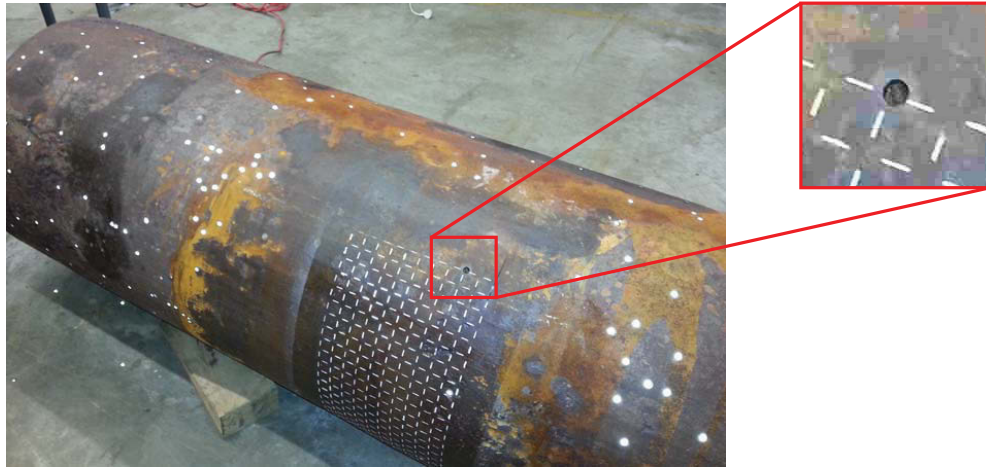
Machined defects on cast iron pipes
